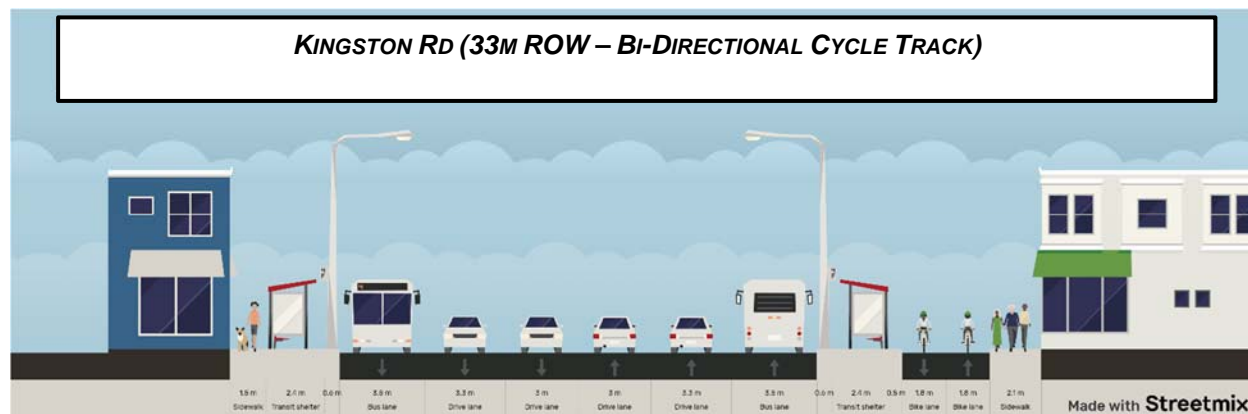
KINGSTON ROAD – CONCEPTUAL CROSS-SECTION FOR 33-METRE ROW
